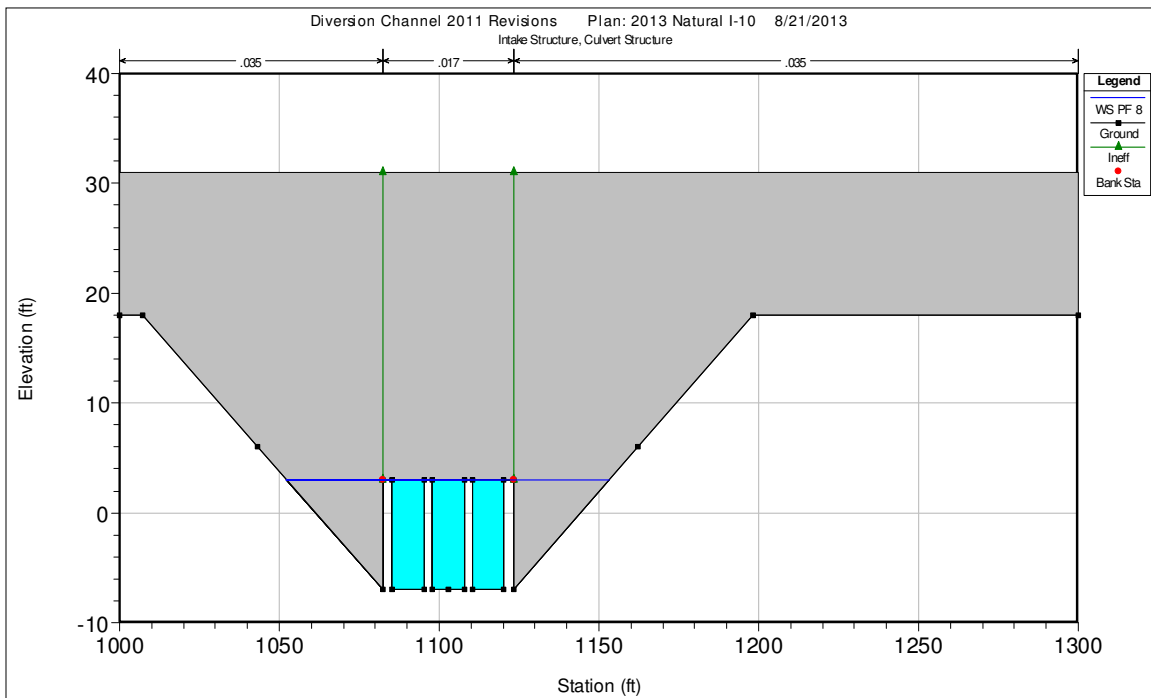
A 290' culvert was modeled in HEC-RAS as the final part of the intake structure simulation.
